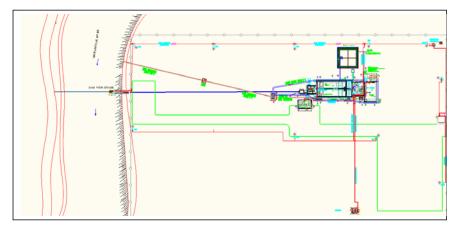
Location Plan of Proposed Sethamouak Water Treatment Plan
